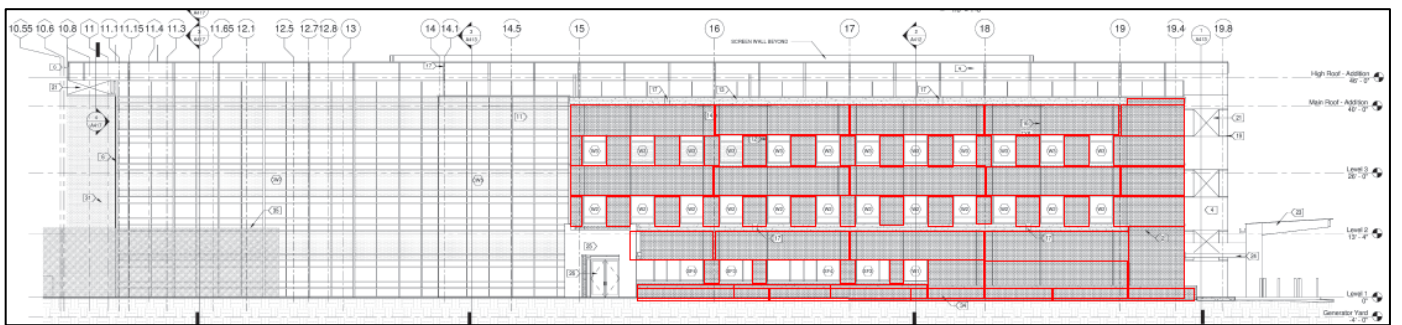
, West elevation - The first floor pharmacy did not permit use of vertical panels on this facade.
